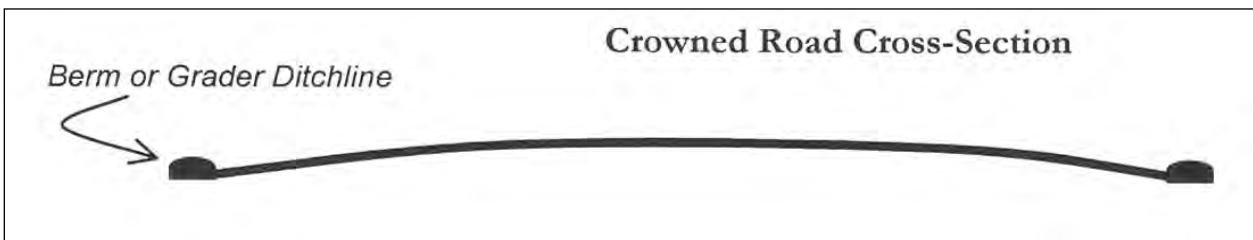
M: Schematic cross-sectional sketch of crowned road surface profile
